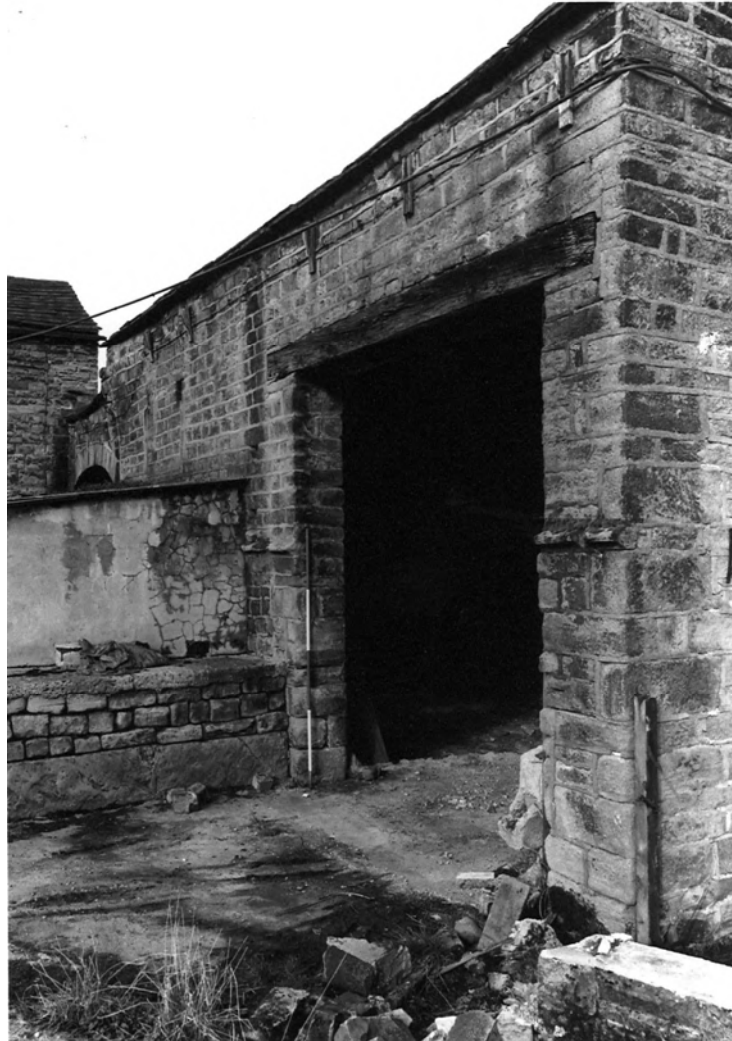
Shaw House Farm: Barn Exterior. Facing North-west.
